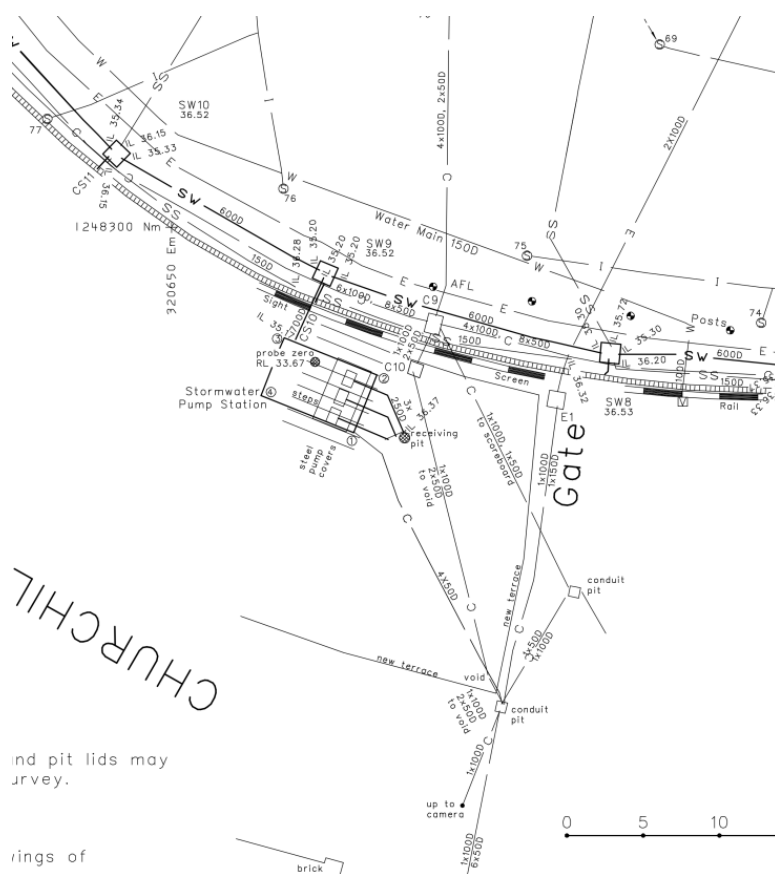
2001 as-built plan, detail showing drainage to storage tank for pump out to street system.
